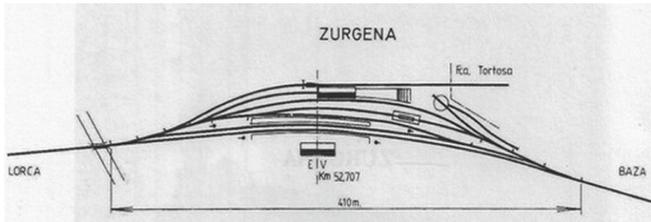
Drawings of Zurgena railway station by Pedro Pintado Quintana.
